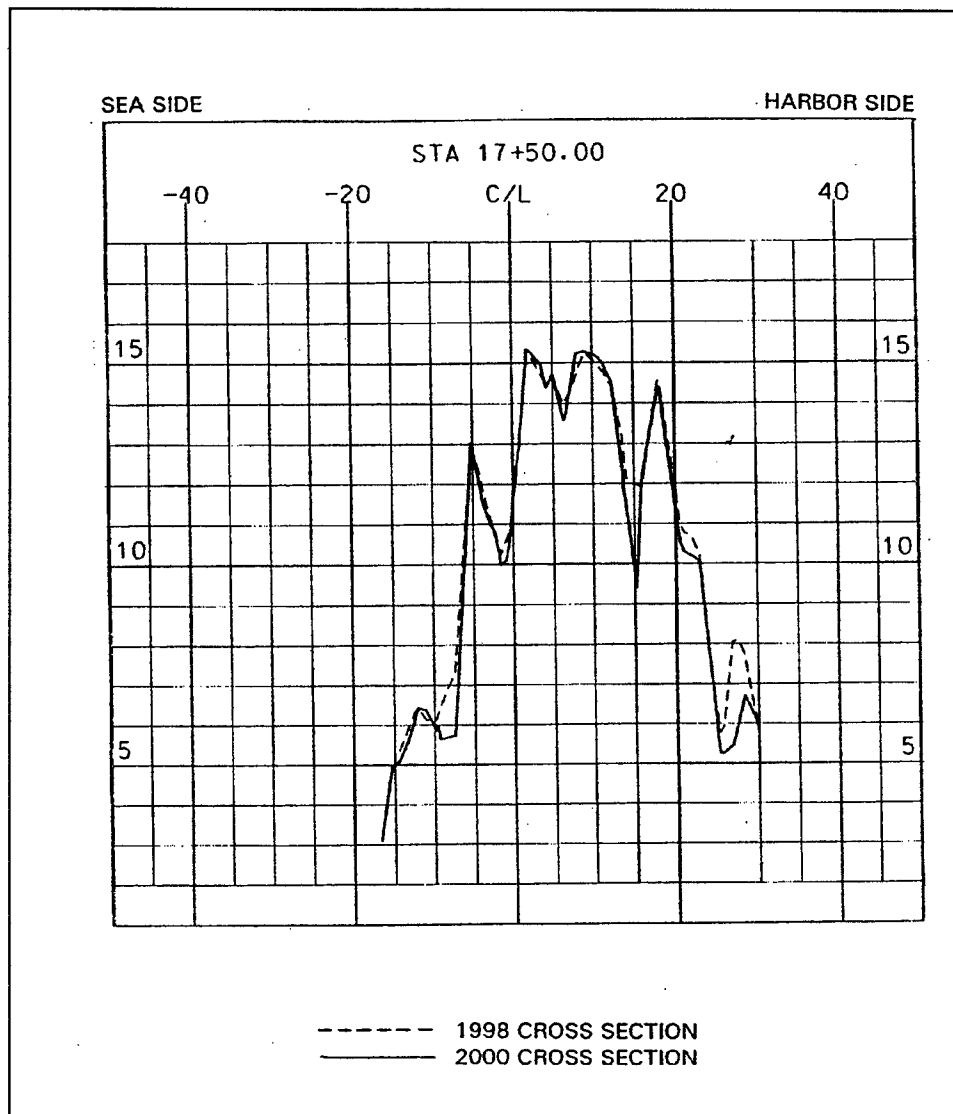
Cross sections of Morro Bay outer south breakwater, sta 17+50
